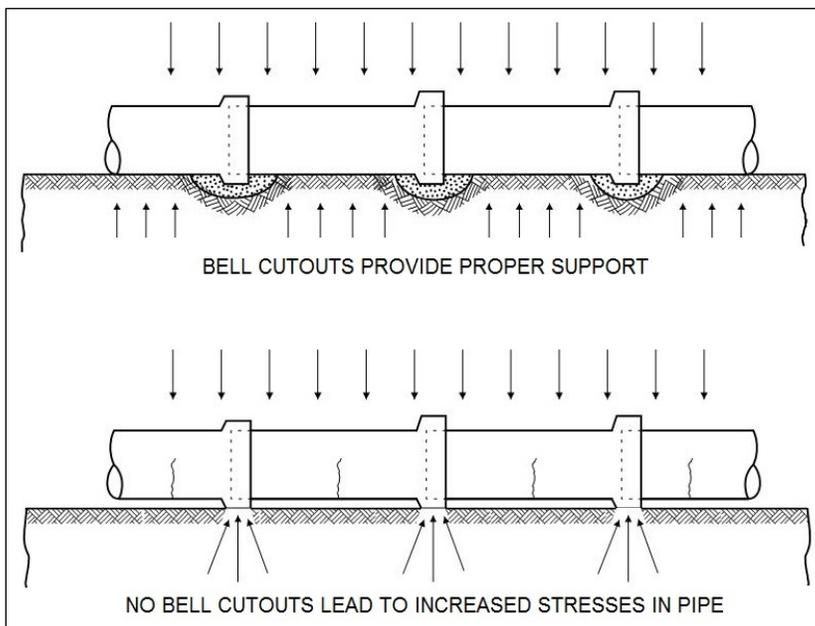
9: Bell and Spigot Pipe Installation Parameters
